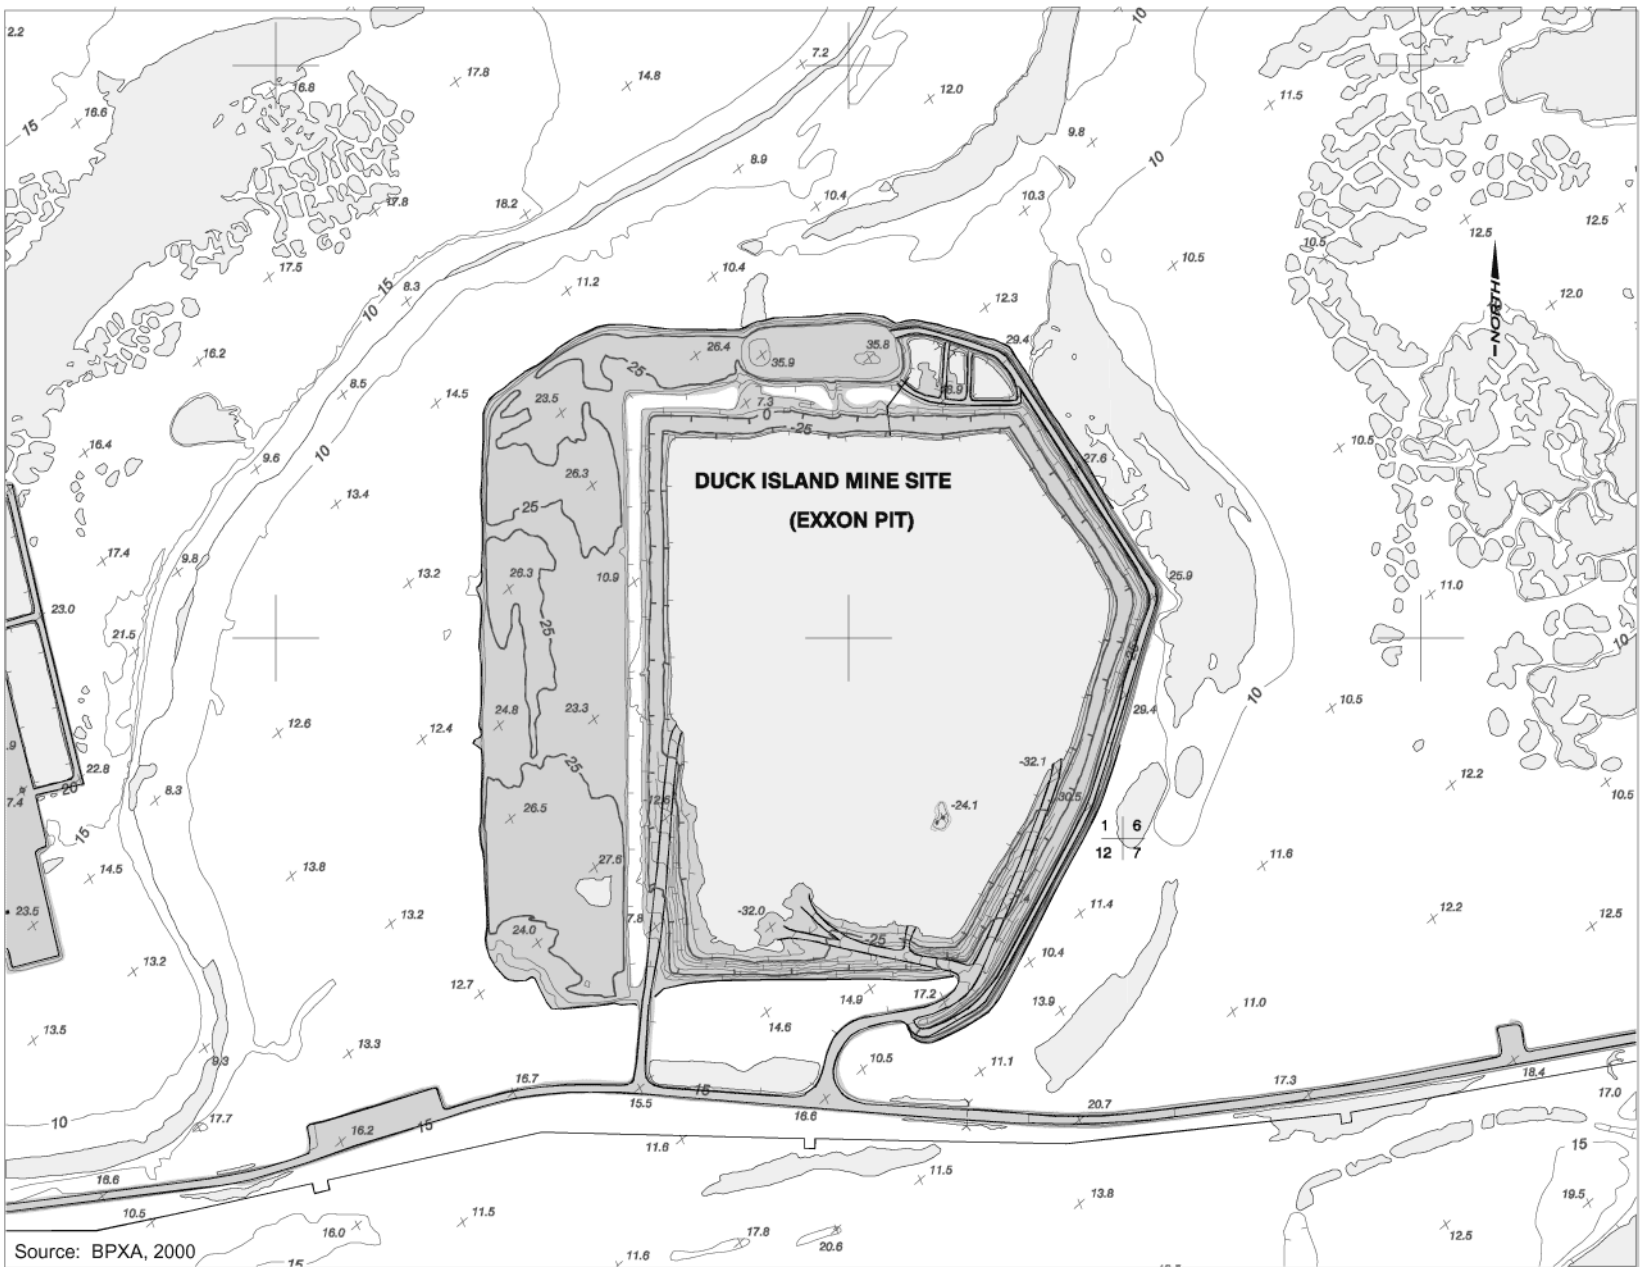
Duck Island Mine Site - Existing Facility - Plan View
